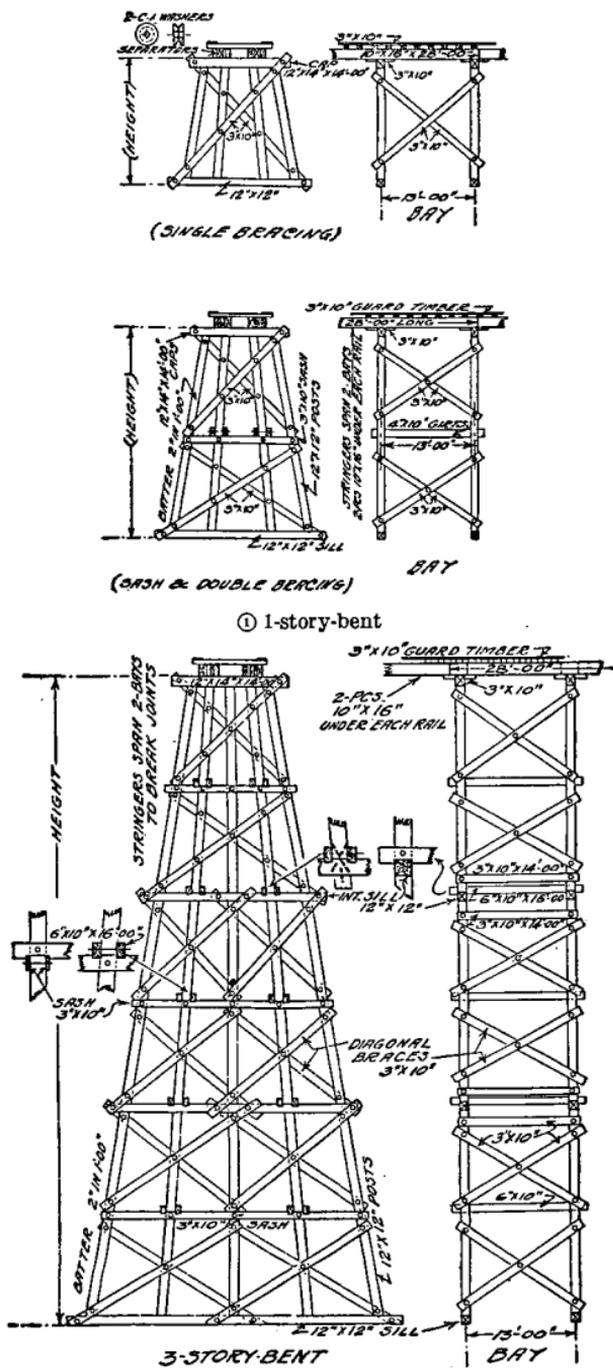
Timber trestle bridges for standard gauge railways
